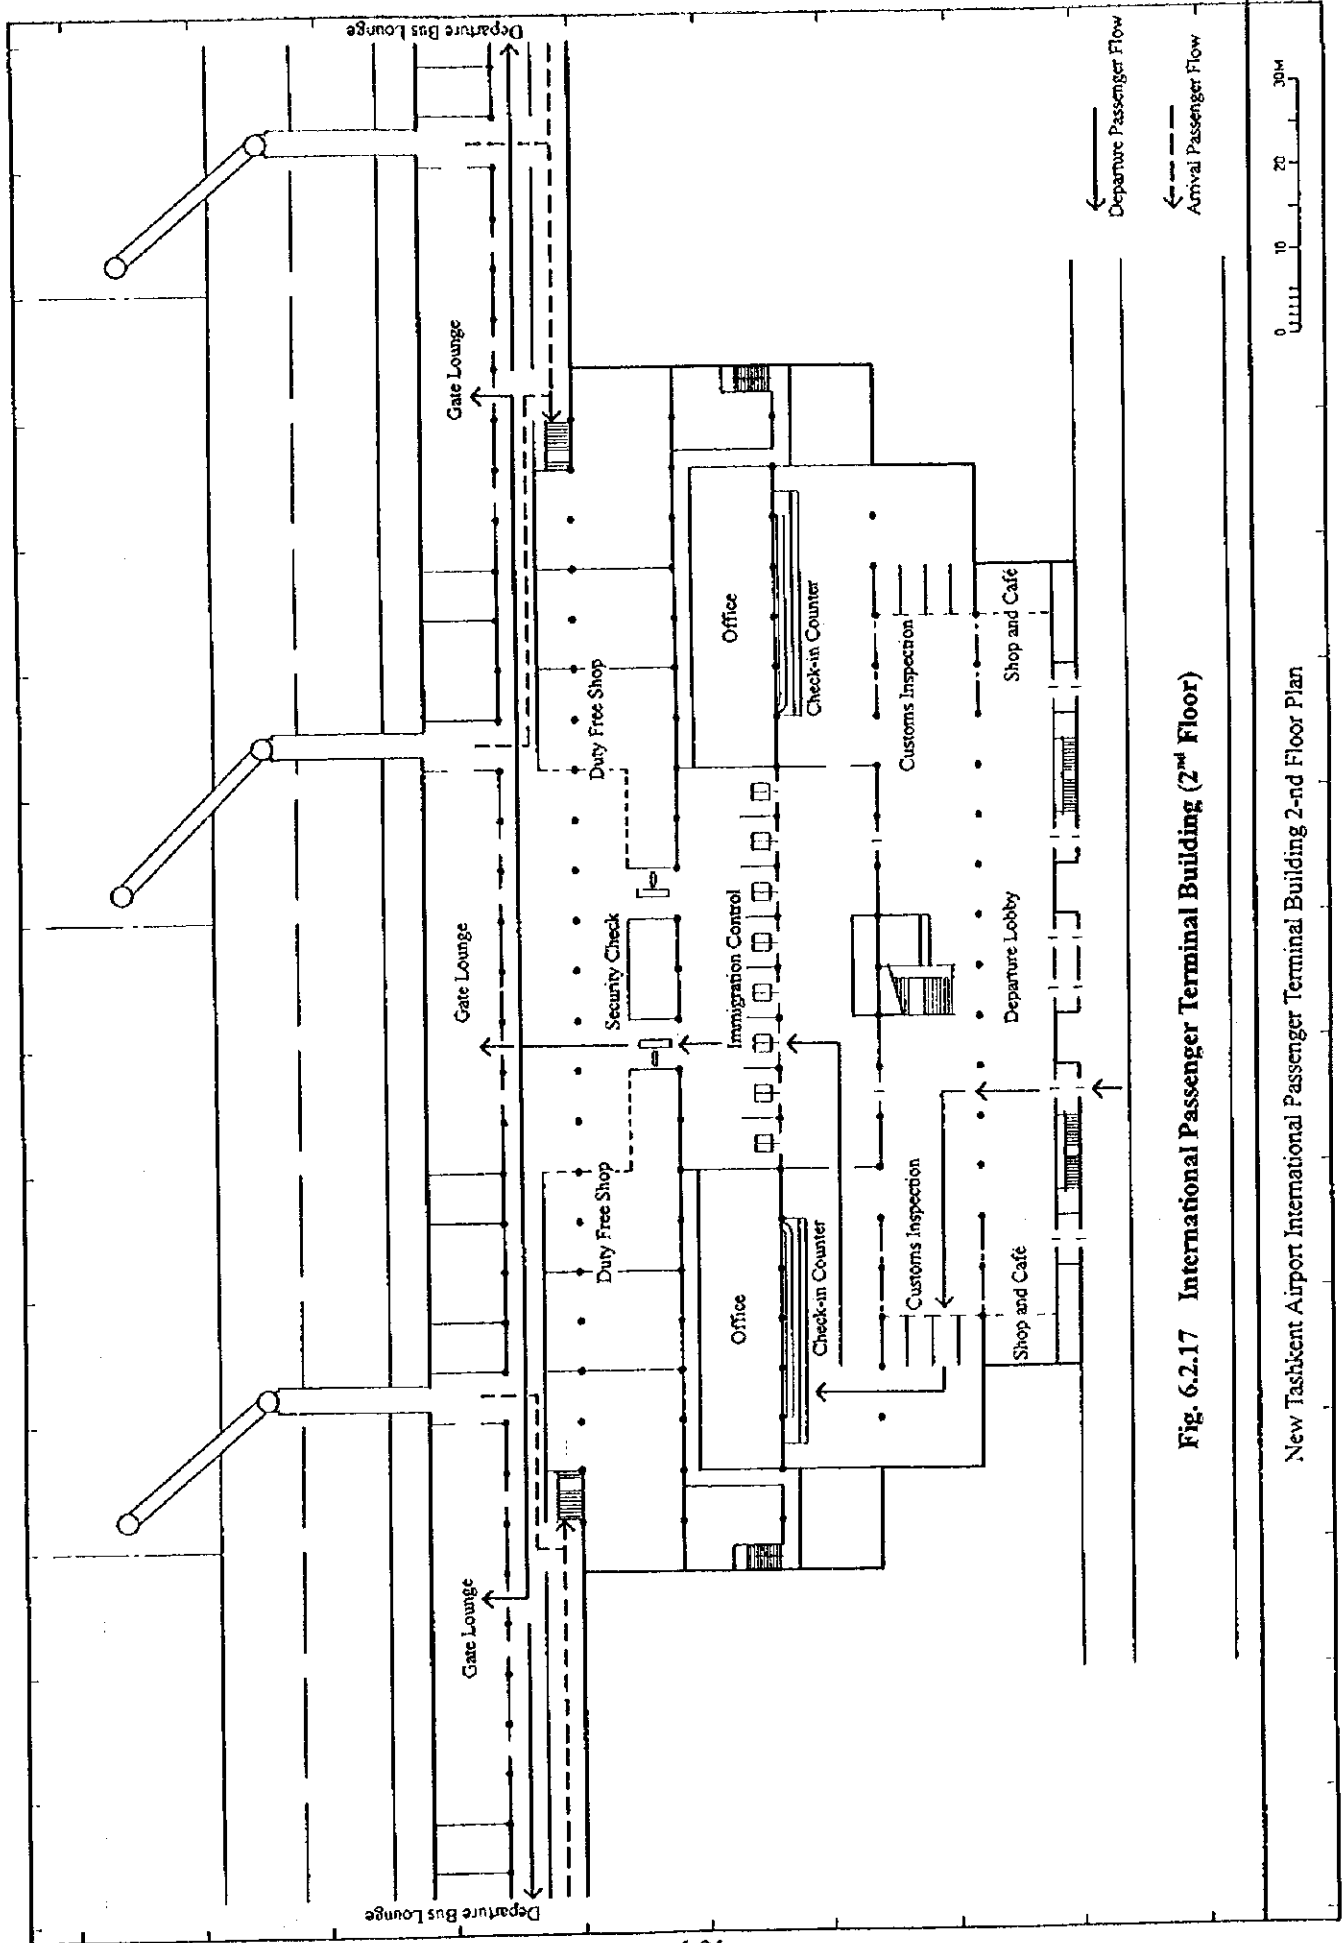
International Passenger Terminal Building (2nd Floor)
